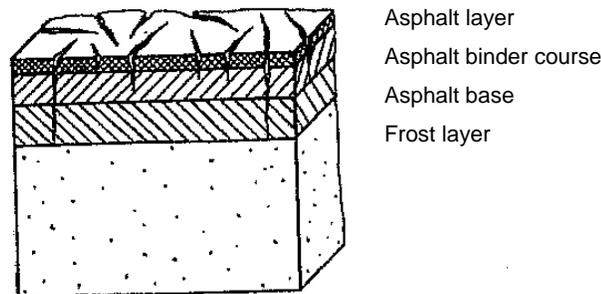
Cracks in the longitudinal and transverse directions in asphalt pavements
